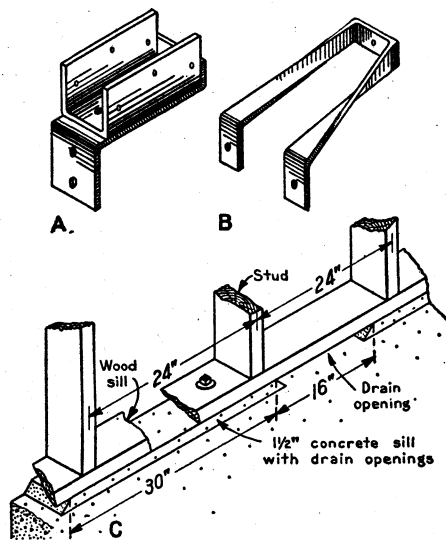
Types of anchorage for studs: A, Pressed-metal anchor; B, strap-iron anchor; C, wood sill bolted to concrete foundation, with weep holes through concrete subsill for floor drainage
